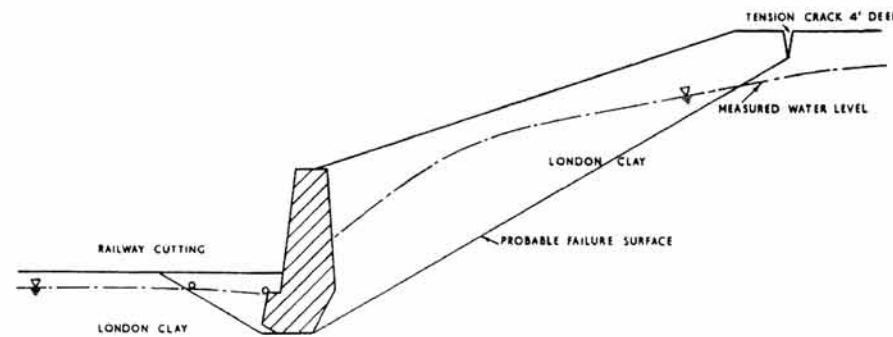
Retaining wall failure in stiff-fissured London clay (after Henkel, 1957).
